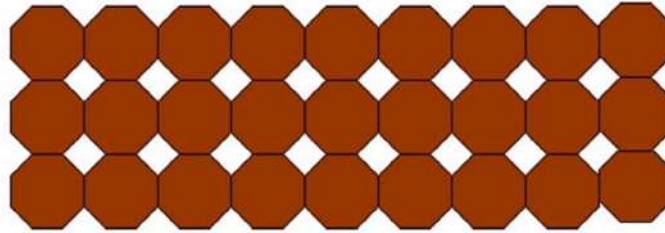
5: Schematic of concrete paver blocks (permeable paving stone pavement) (James & Von Langsdorff, 2003)
